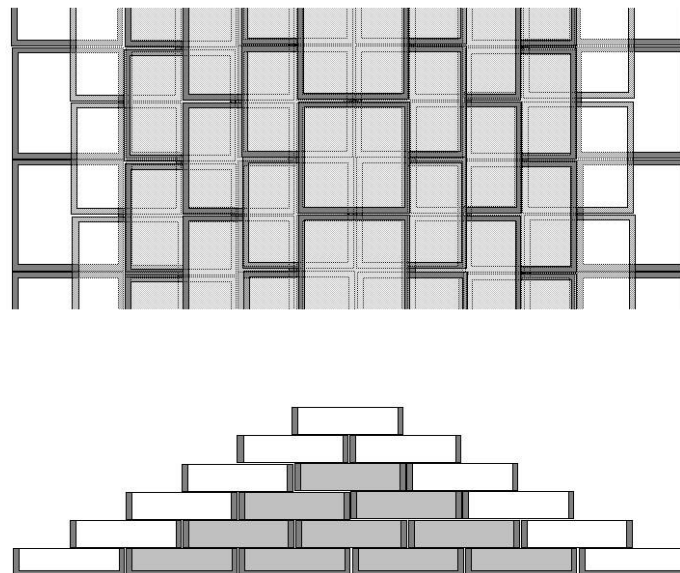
Hollow Element Ridge Crest Structure Composed from Concrete Frames
